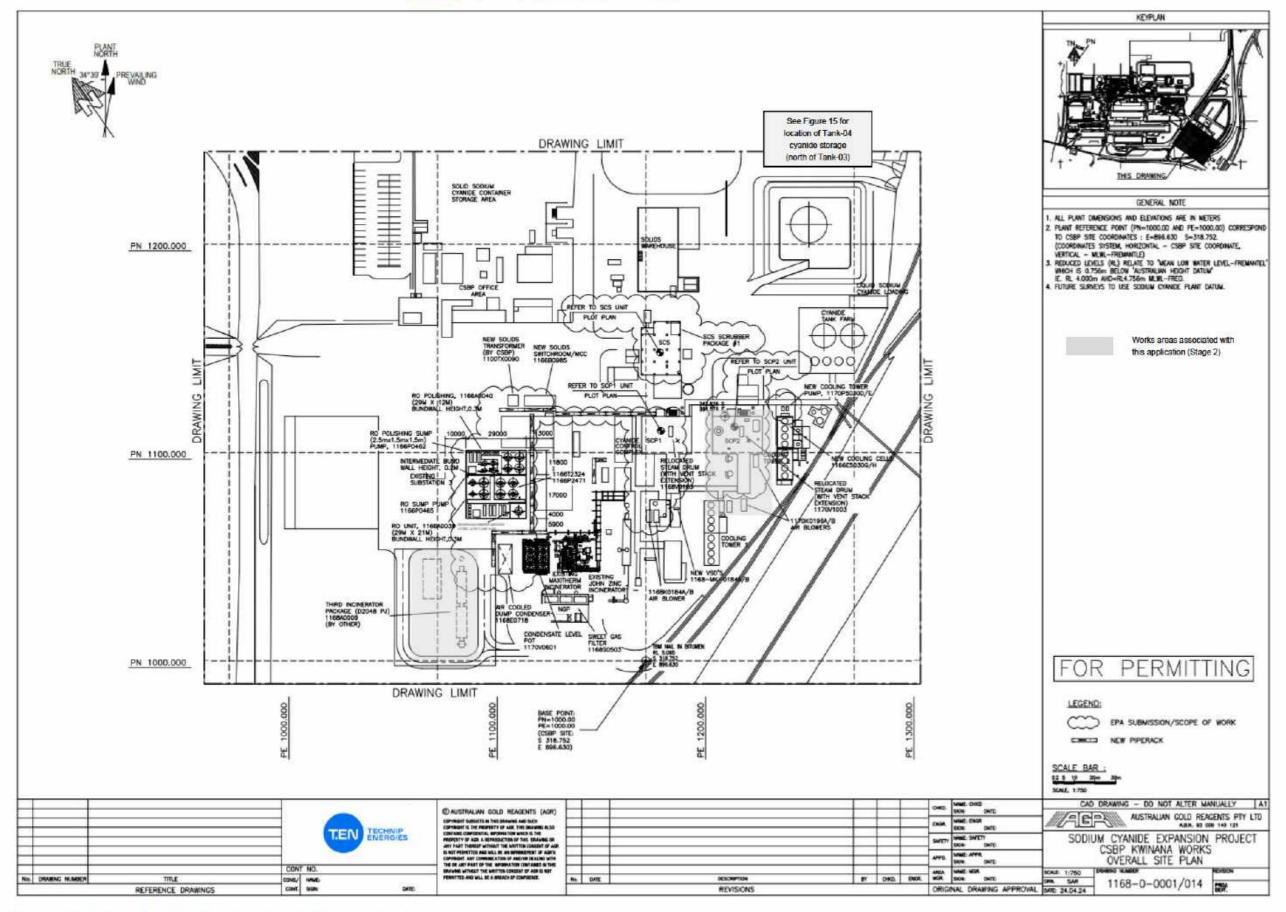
Sodium Cyanide Manufacturing facility plot plan of proposed plant upgrades.
